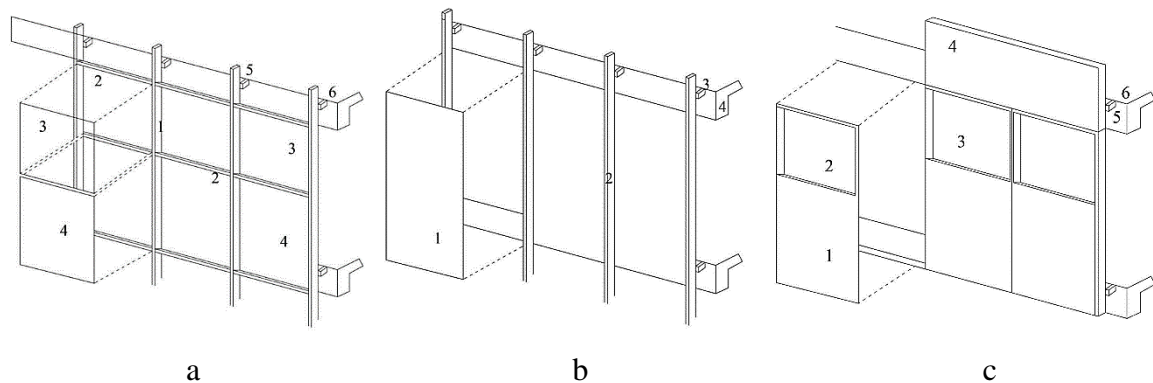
Stick system façade detail (a), Semi-panel system façade detail (b), Panel system façade detail (c) (Ağdemir, 2017)
